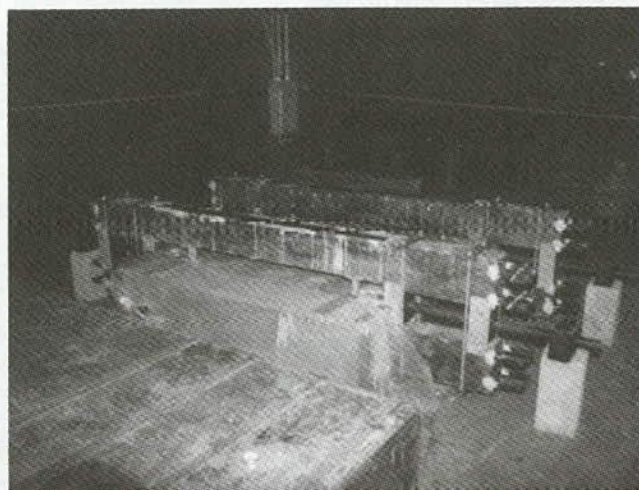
Pretensioned beam specimen under corrosion test simultaneous heating and saltwater ponding conditions.
